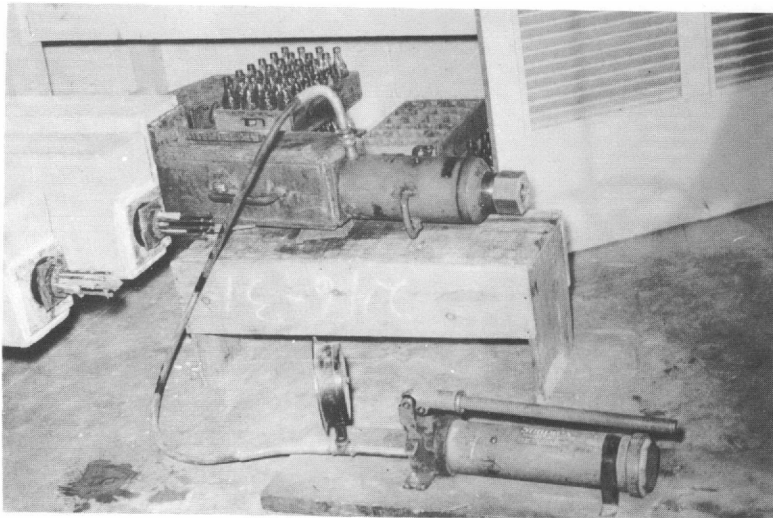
VIEW OF PRESTRESSING APPARATUS
